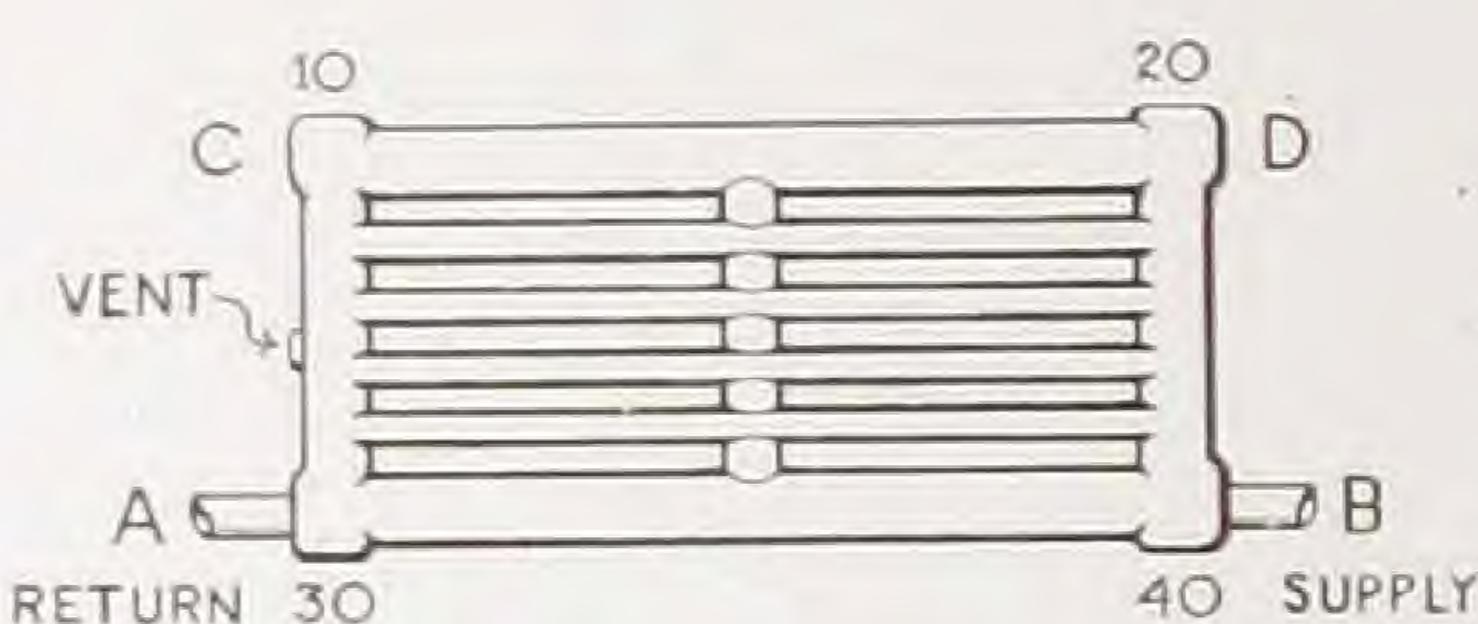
One and Two-Pipe Steam—Regular Horizontal Assembly
